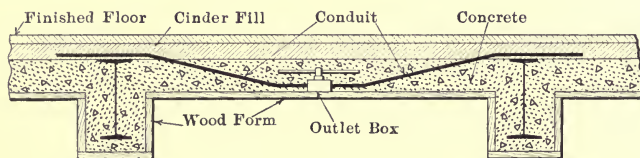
BOX AND CONDUIT EMBEDDED IN CONCRETE FLOOR.
